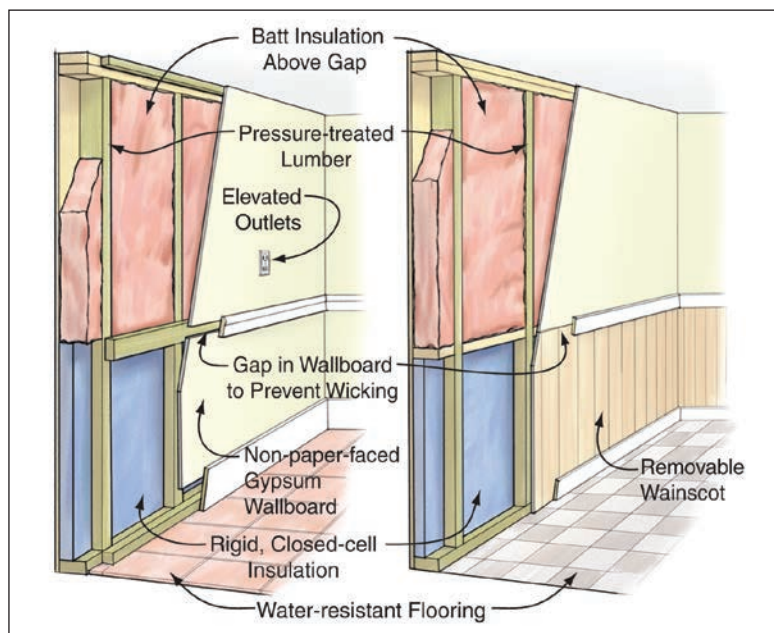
Wet floodproofing techniques for interior wall construction; details may vary depending on wall construction (Source: LSU, 2012)
